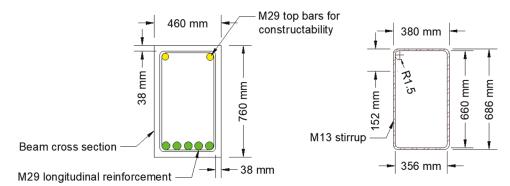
Beam cross section and stirrup dimensions at midspan.
